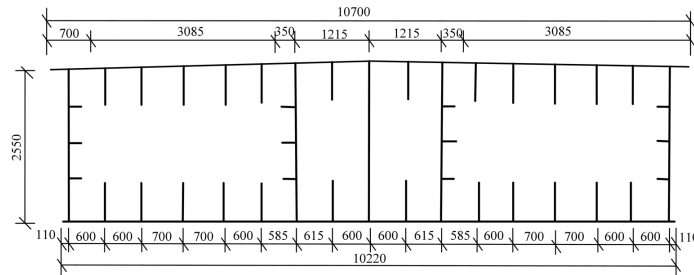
Cross-sectional diagram of the main bridge of Jinzhou Bridge (2) (mm)
